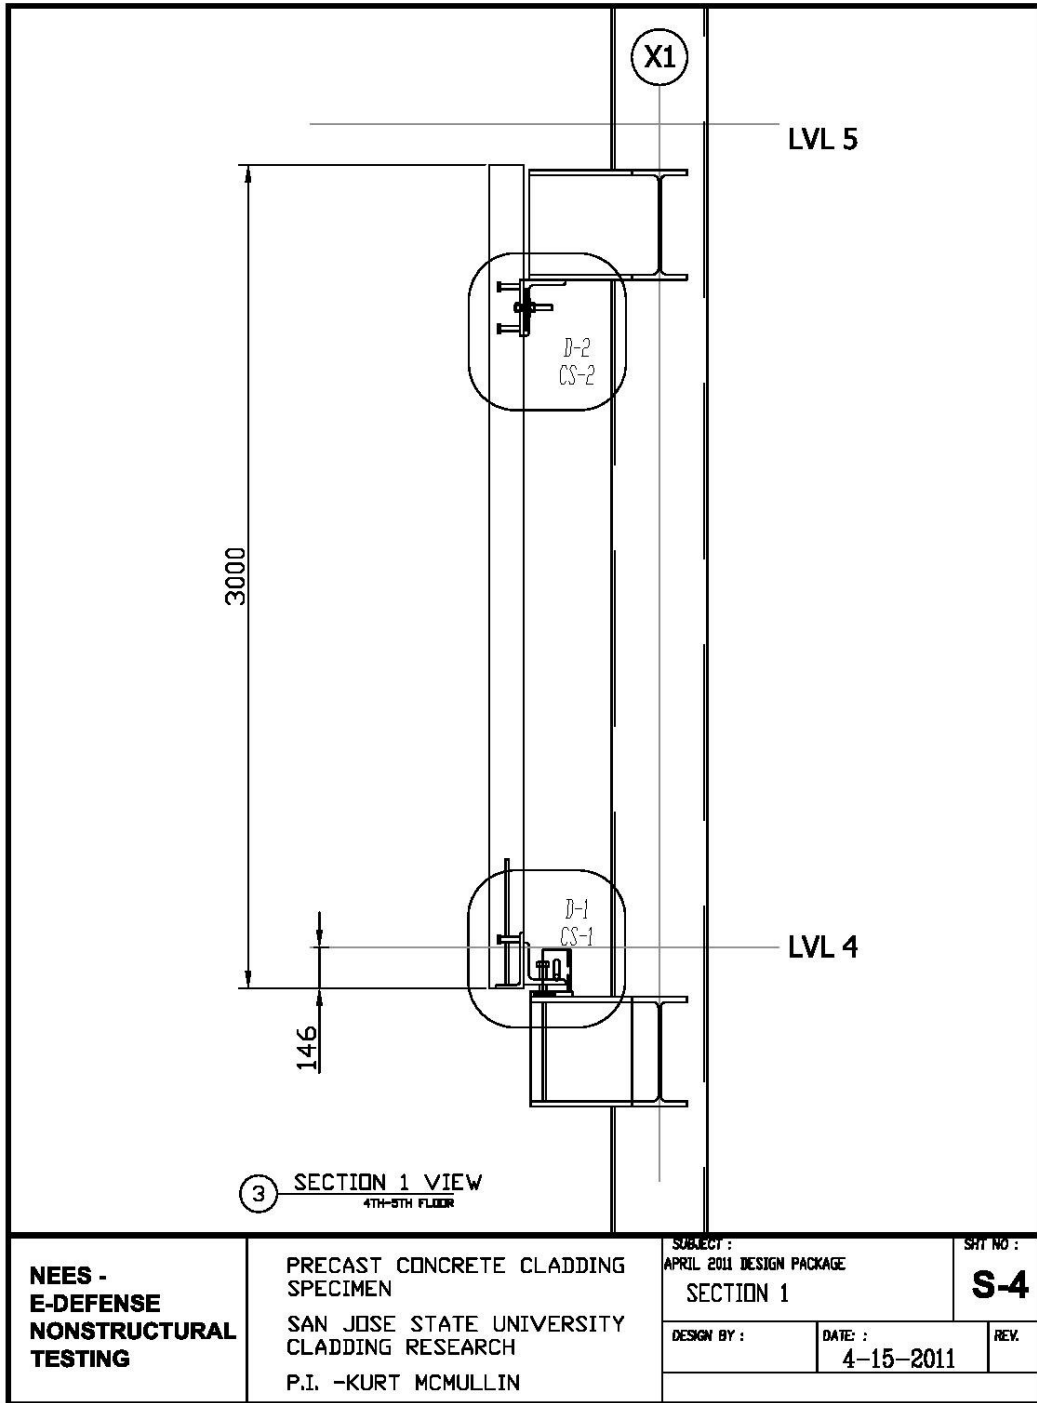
Elevation Highlighting Top Slotted Connection and Bottom Bearing Connection (layout typical to both panels)
